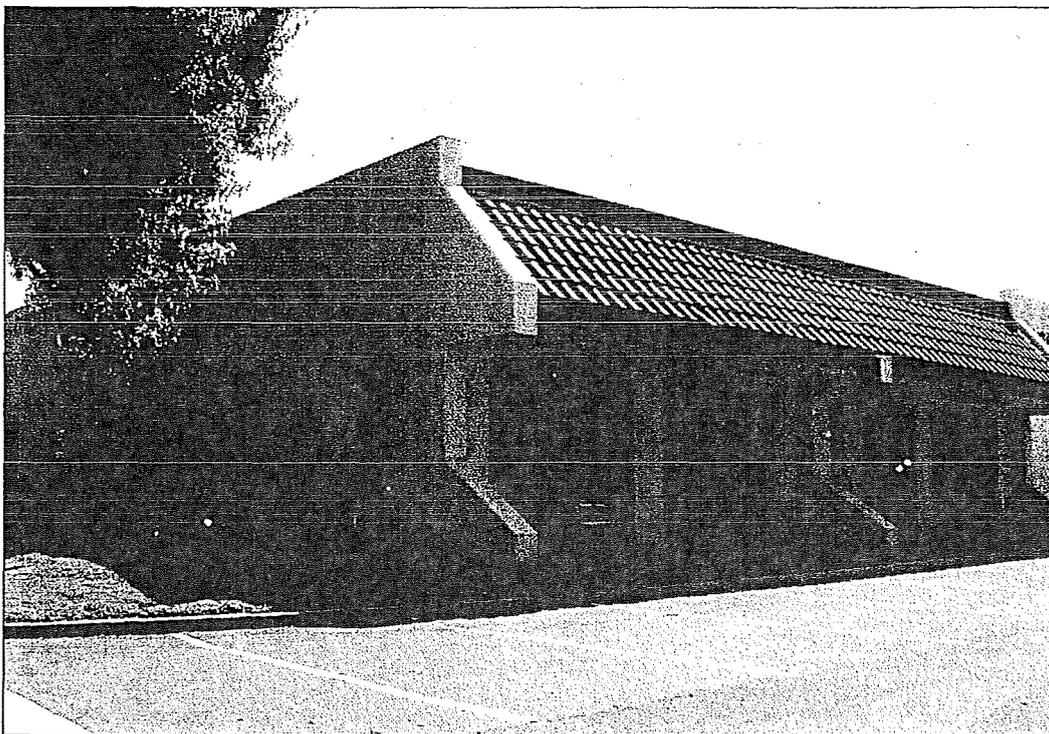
View of the project site, looking southeast from northwest corner of the project site.
